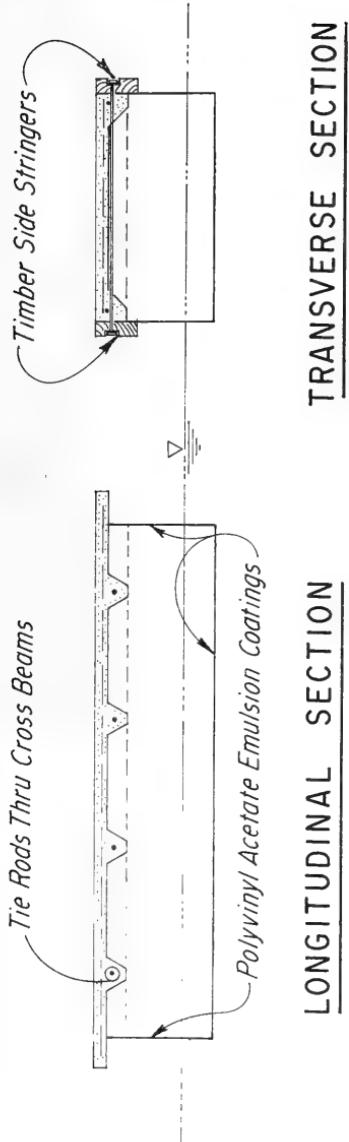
Foam float with concrete deck (courtesy of Floating Dock Systems).
